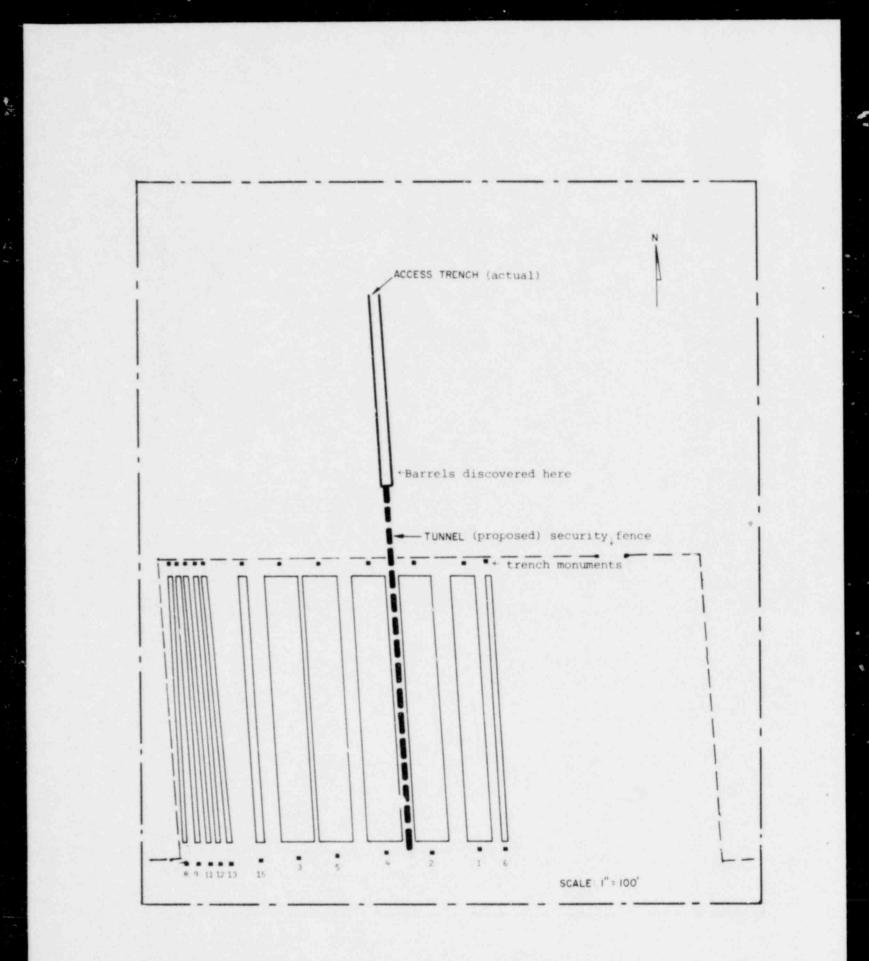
Facility Layout Nuclear Waste Trenches (North Section) at the NECO Site near Beatty, Nevada; Showing USGS Access Trenches and Tunnel Complex.
